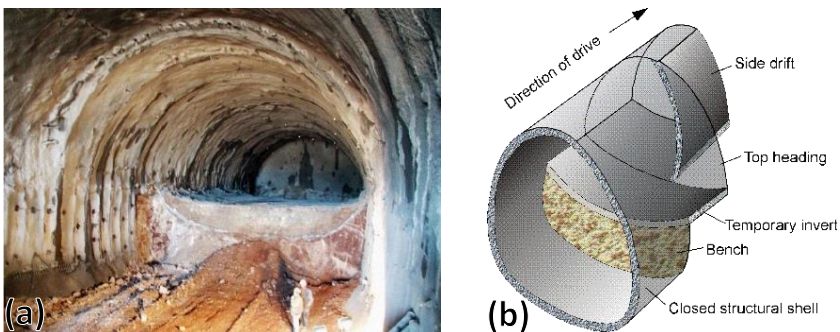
Partitioned excavation face, photo ([Hoek et al., 2008](#)) showing top-bench division with a temporary shotcrete invert (a) and scheme ([Hoek, 2004](#)) with other possible sections (b).
